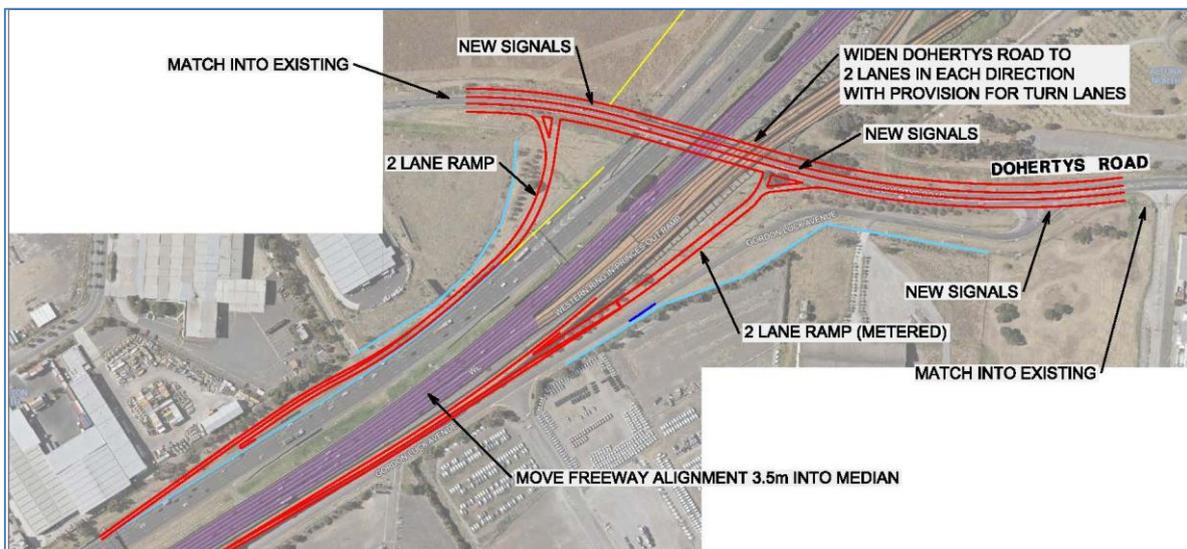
Modified plan for Dohertys Road west-facing ramps
